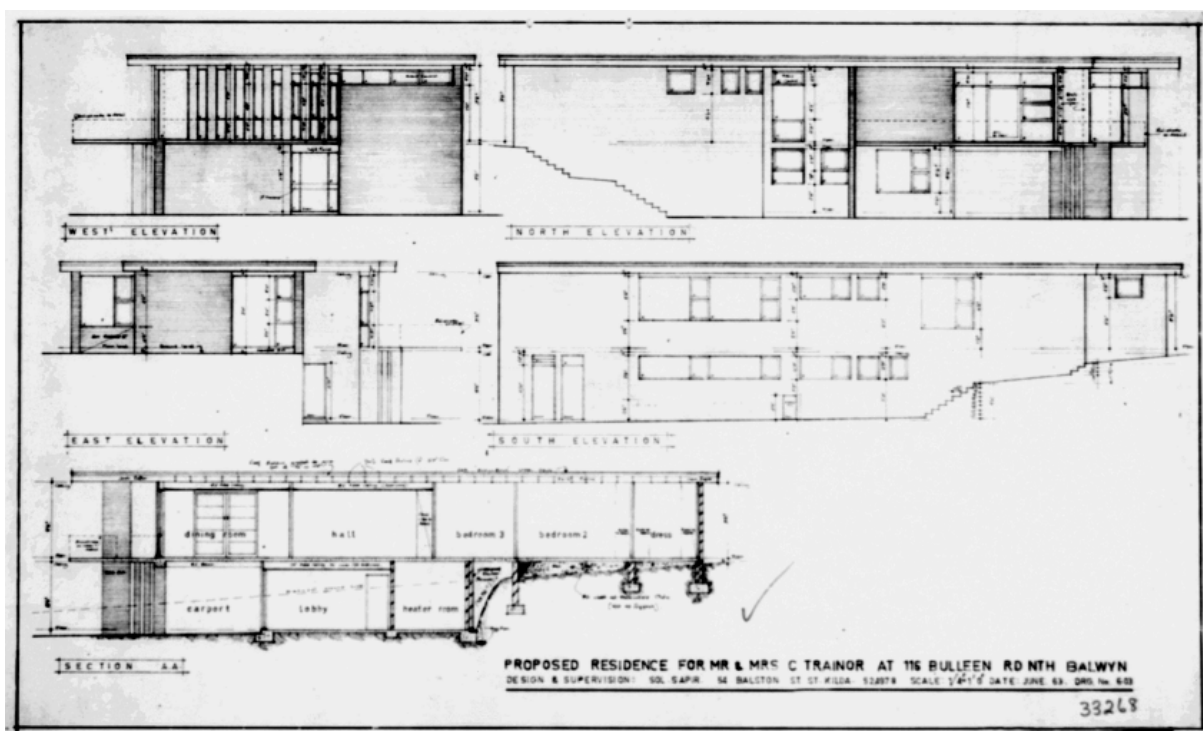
Architectural drawings by Sol Sapir for 116 Bulleen Road, North Balwyn showing elevations and section. (Source: BP 33268)
